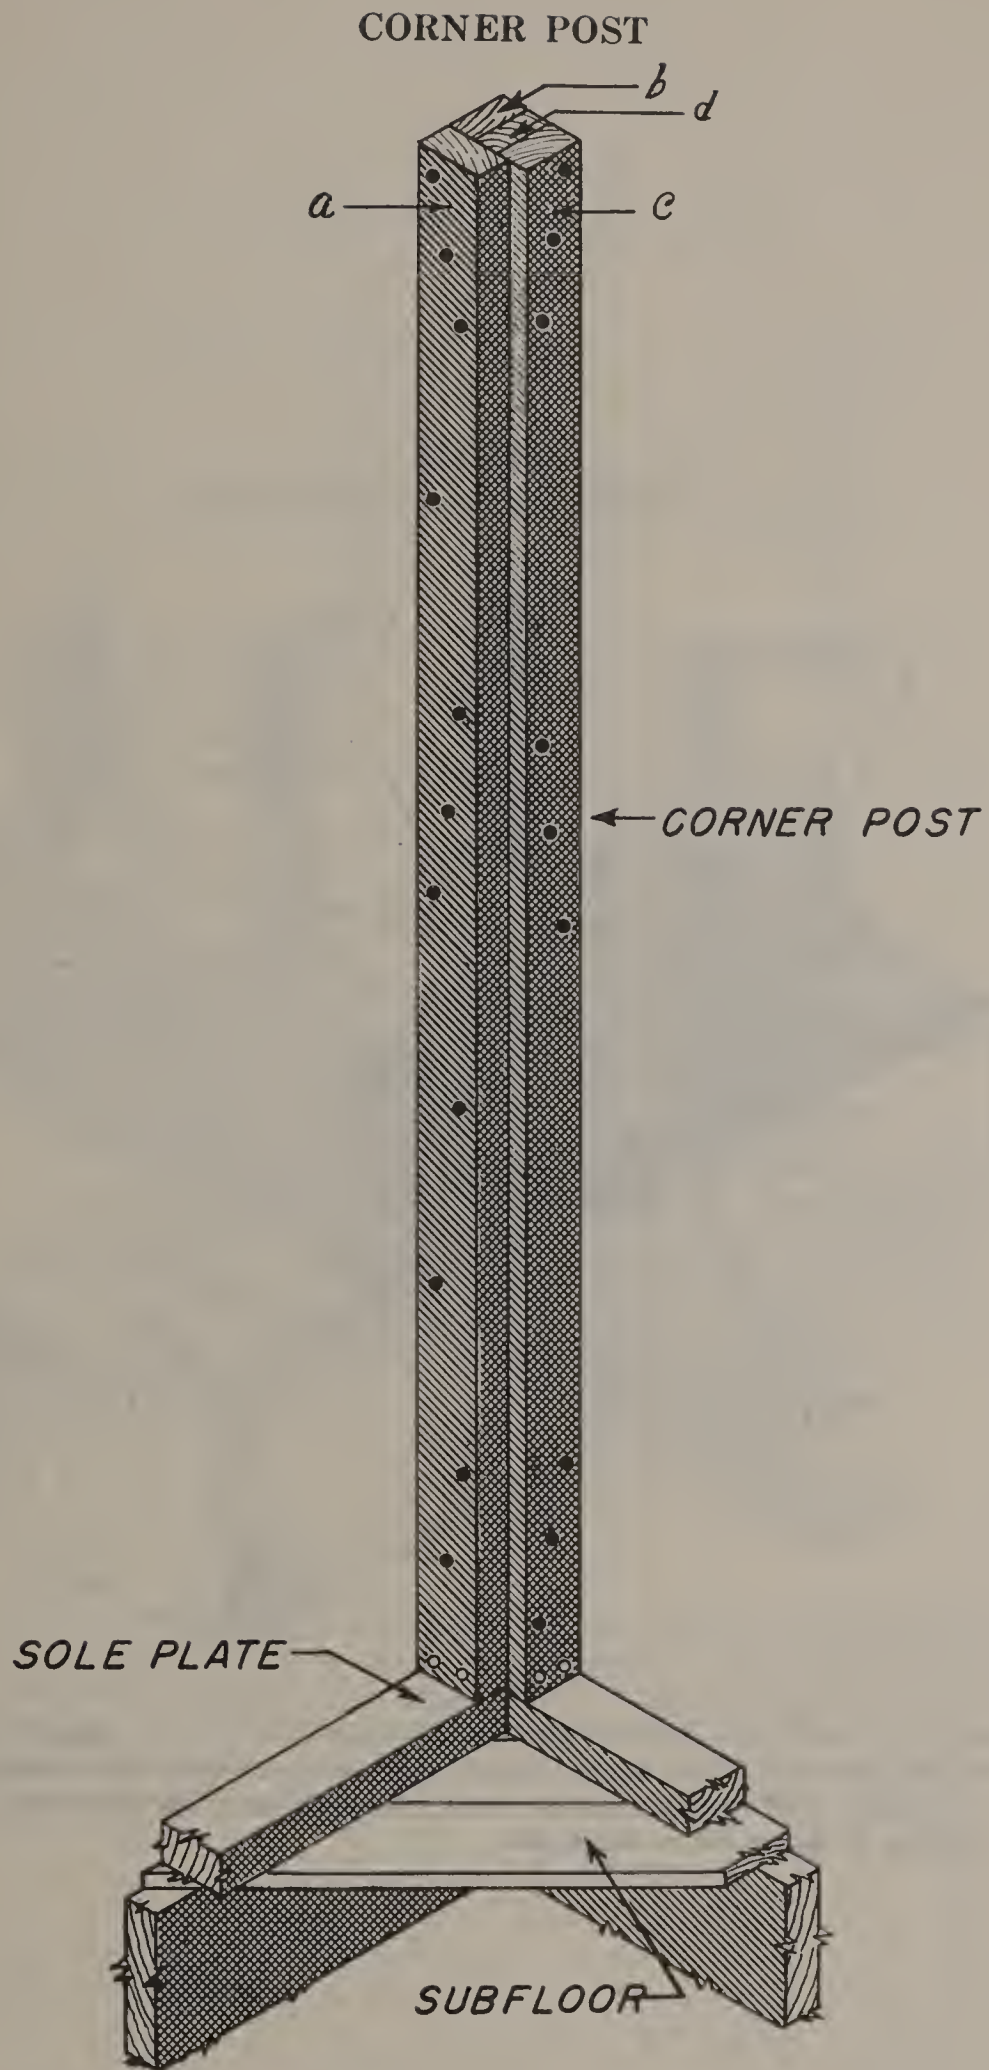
Corner post. Stud *a* nailed to studs *b* and *c* with tenpenny nails staggered 12 inches, and to each filler block *d* with one tenpenny nail. Studs *b* and *c* each nailed to each filler block with three tenpenny nails. Corner post toenailed to sole plate with two eightpenny nails on each face.
